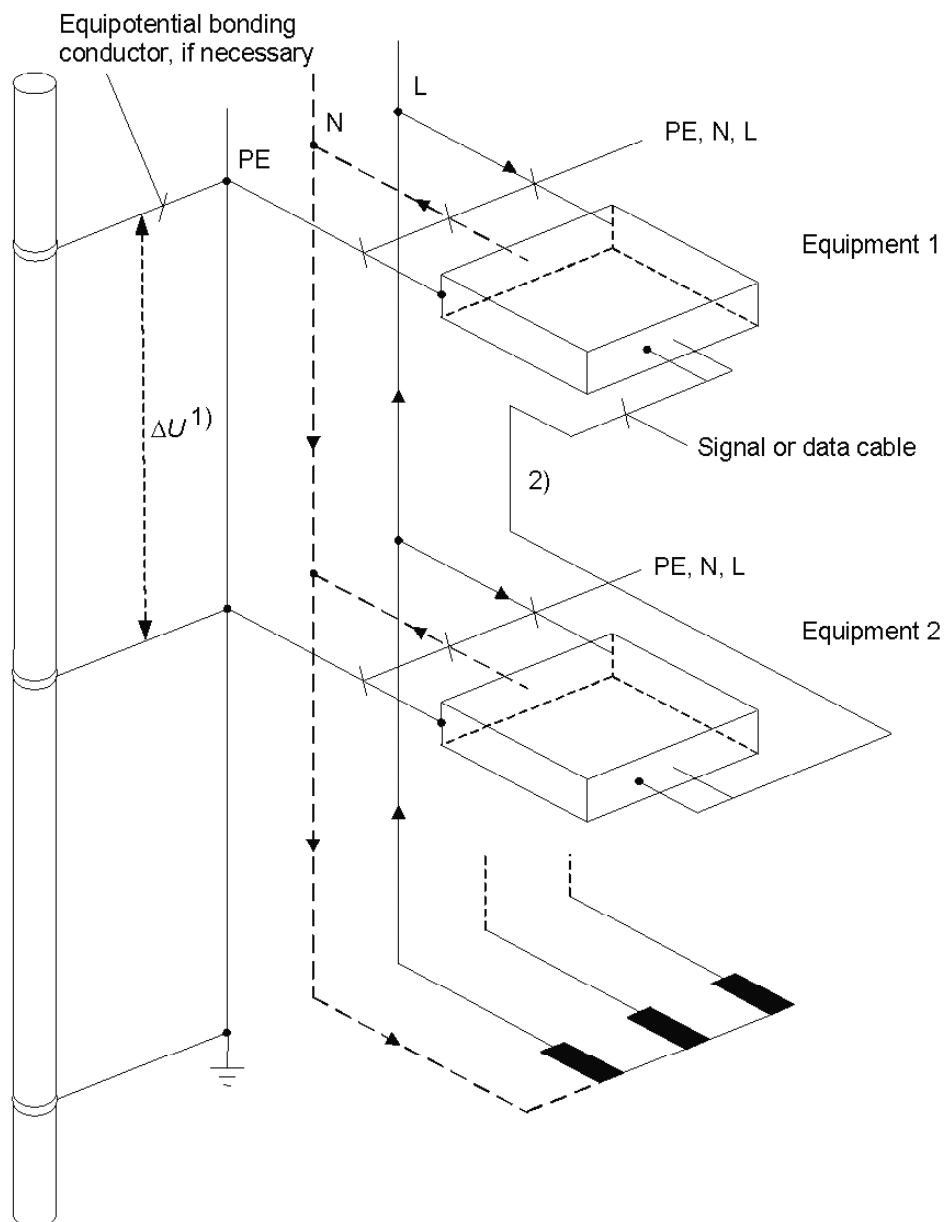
TN-C-S SYSTEM WITHIN AN EXISTING BUILDING INSTALLATION
